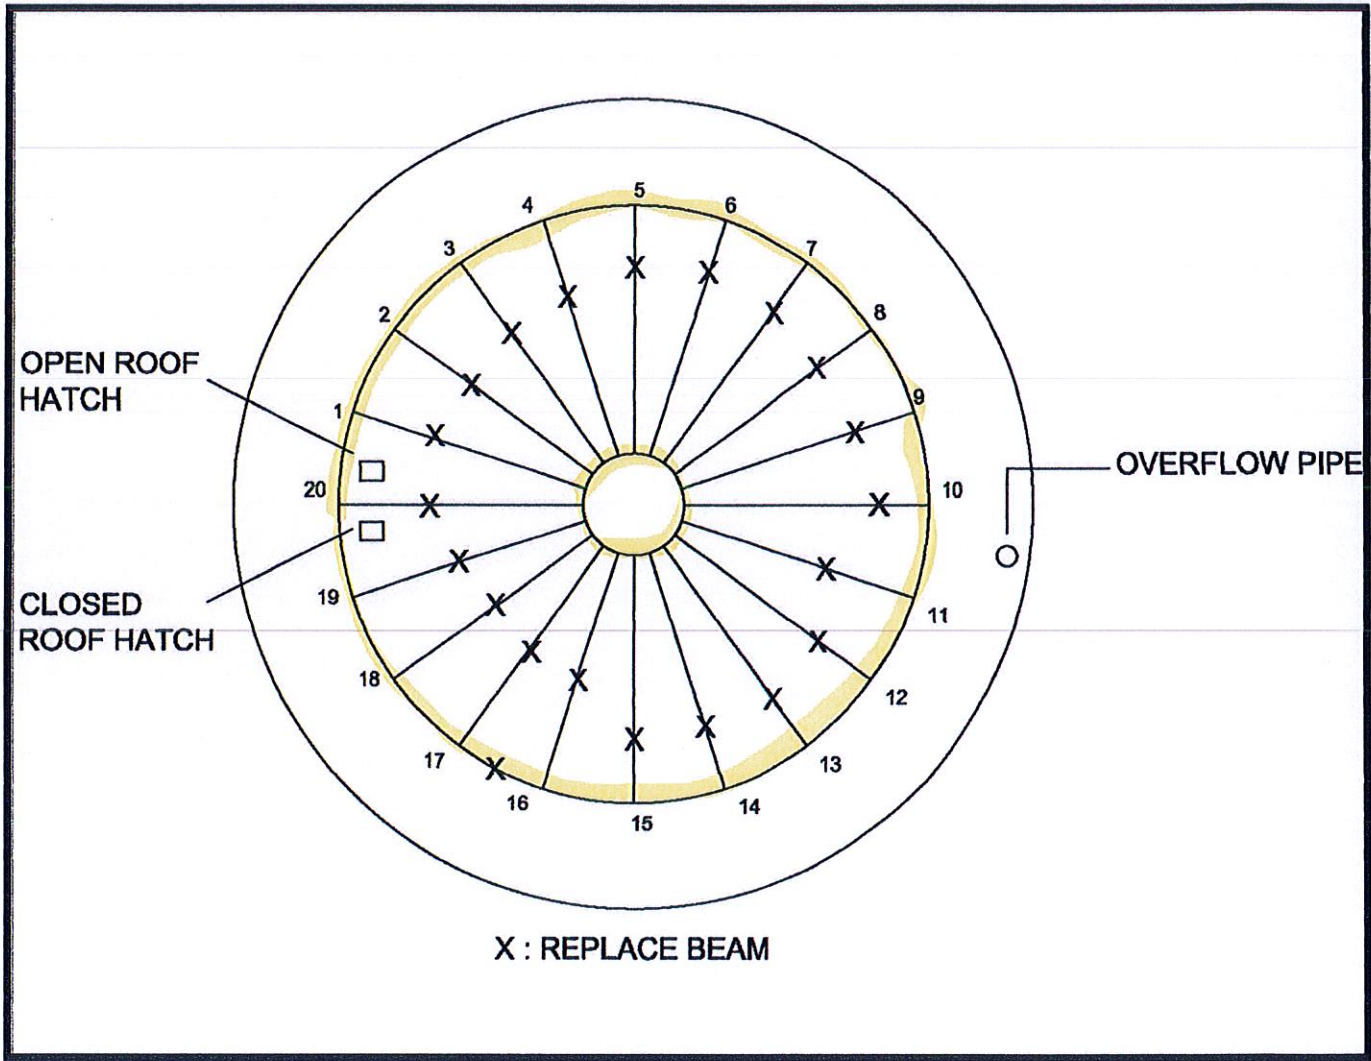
Summary Sketch of East Tank Roof Beam Condition Assessment
